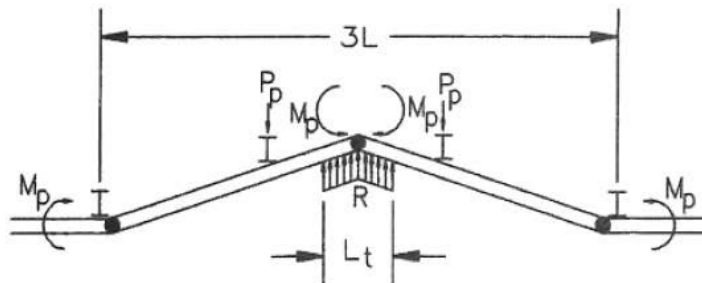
Three-Span Failure Mode for Post-and-Beam Railings
